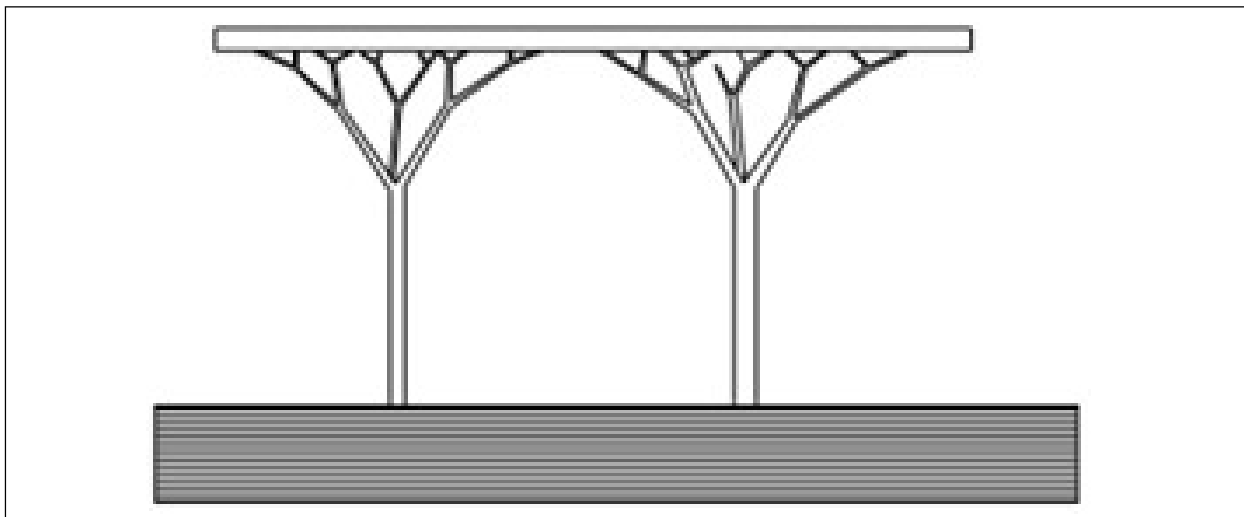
Branching as Structural System Design Sketches by Frei Otto
